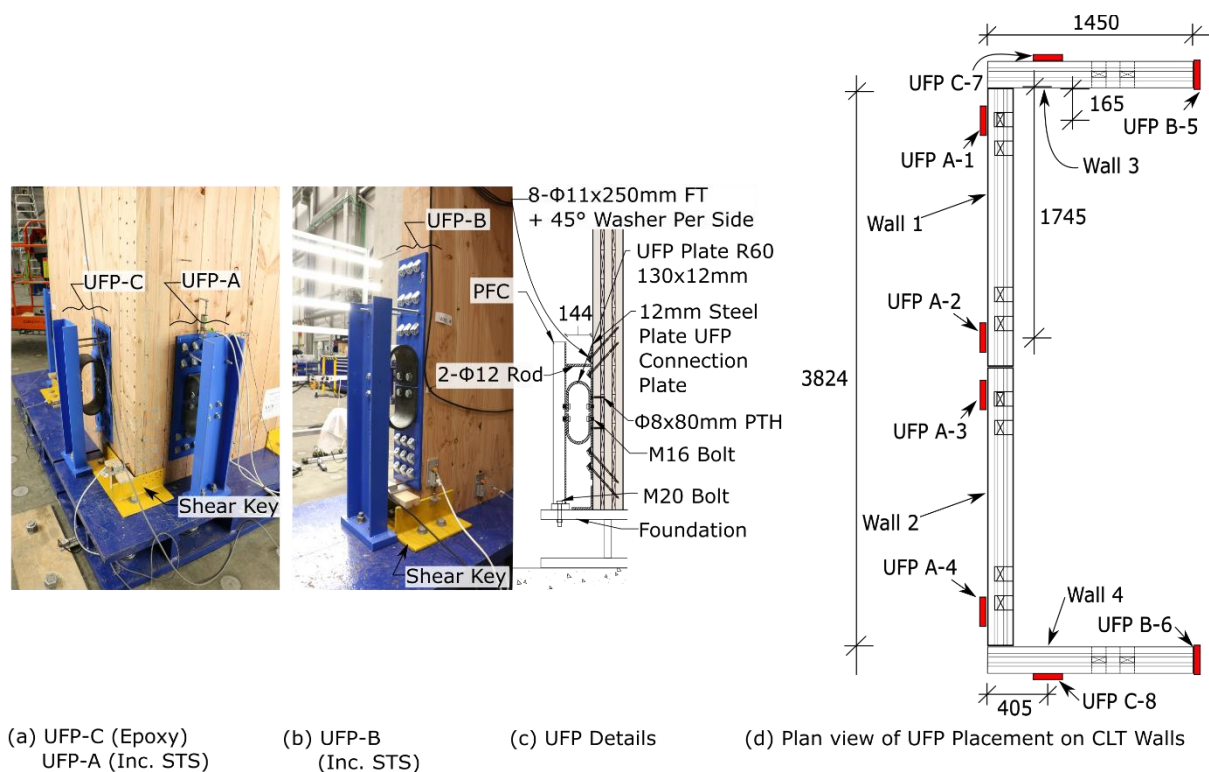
UFP connection detailing: (a) UFP-A and UFP-C, (b) UFP-B, (c) UFP Details, and (d) plan view of the UFP placement on the CLT walls
